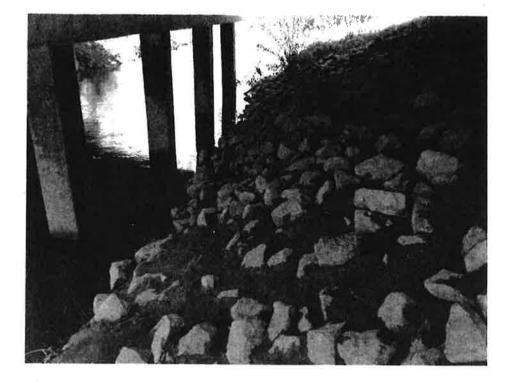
Riprap on stream bank under Bridge 2 looking upstream.
